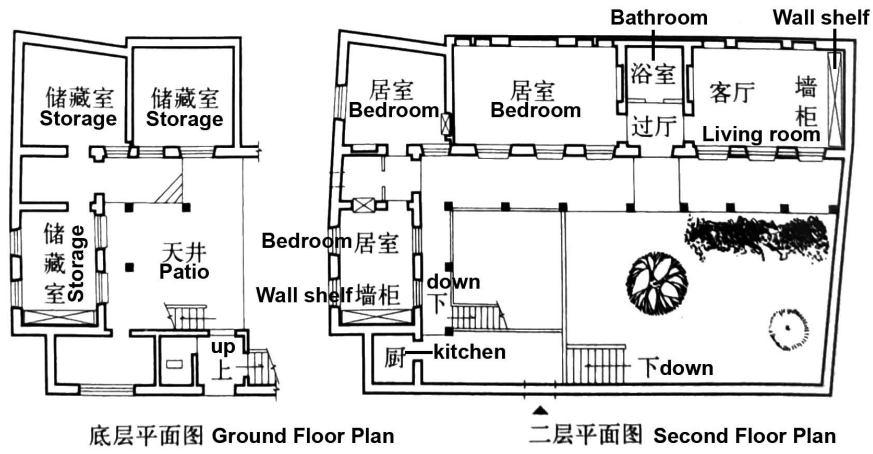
Sample Uyghur house in Turpan region layout plan.⁵³ Translated by author.
